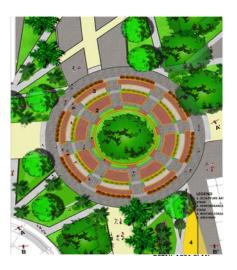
Detail Area Plan of Historical Street of Jalan Tuanku Abdul
